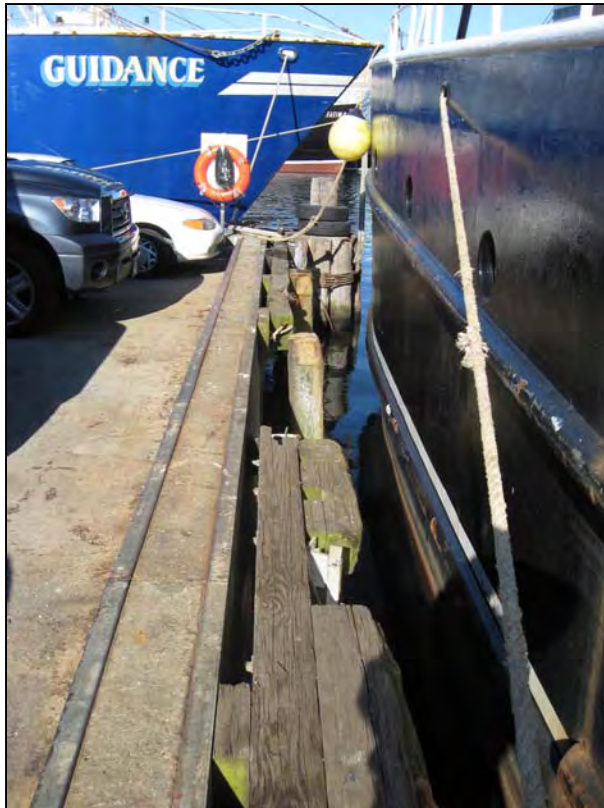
Damaged fender system from station 8+20 to Station 8+65.
